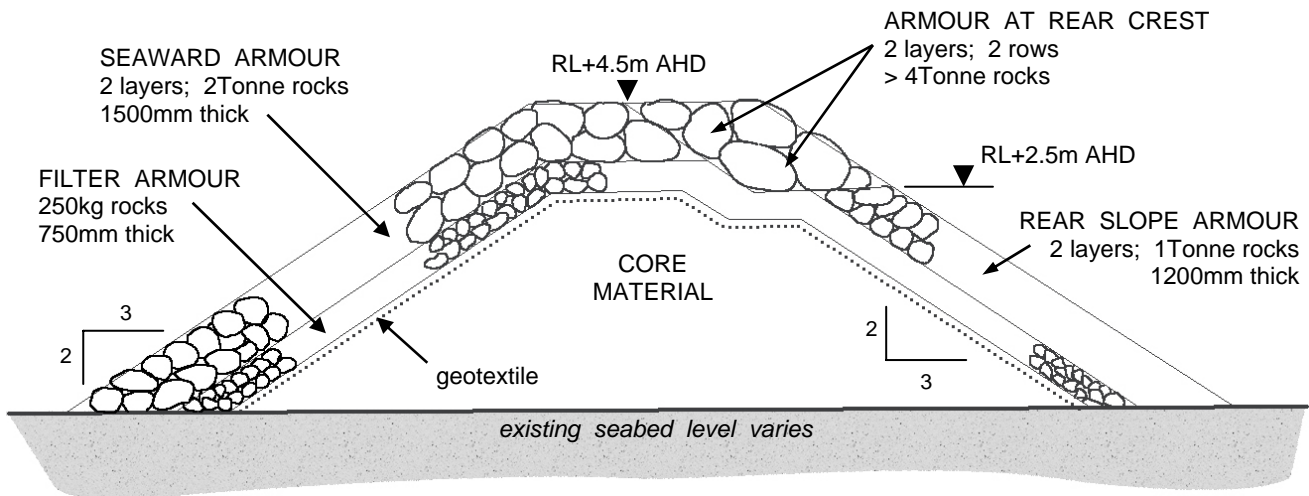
Viable Structural Concept - Strand Breakwater
